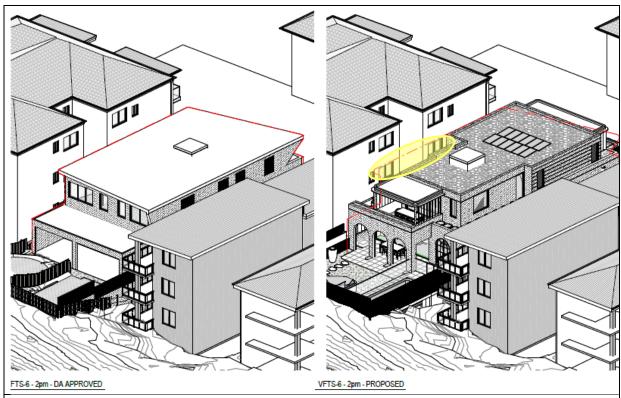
View front the sun, 21 June, 2pm showing the DA approved building (left) and the subject proposal (right). The windows that will receive solar access as a result of the proposed amendments are highlighted.
